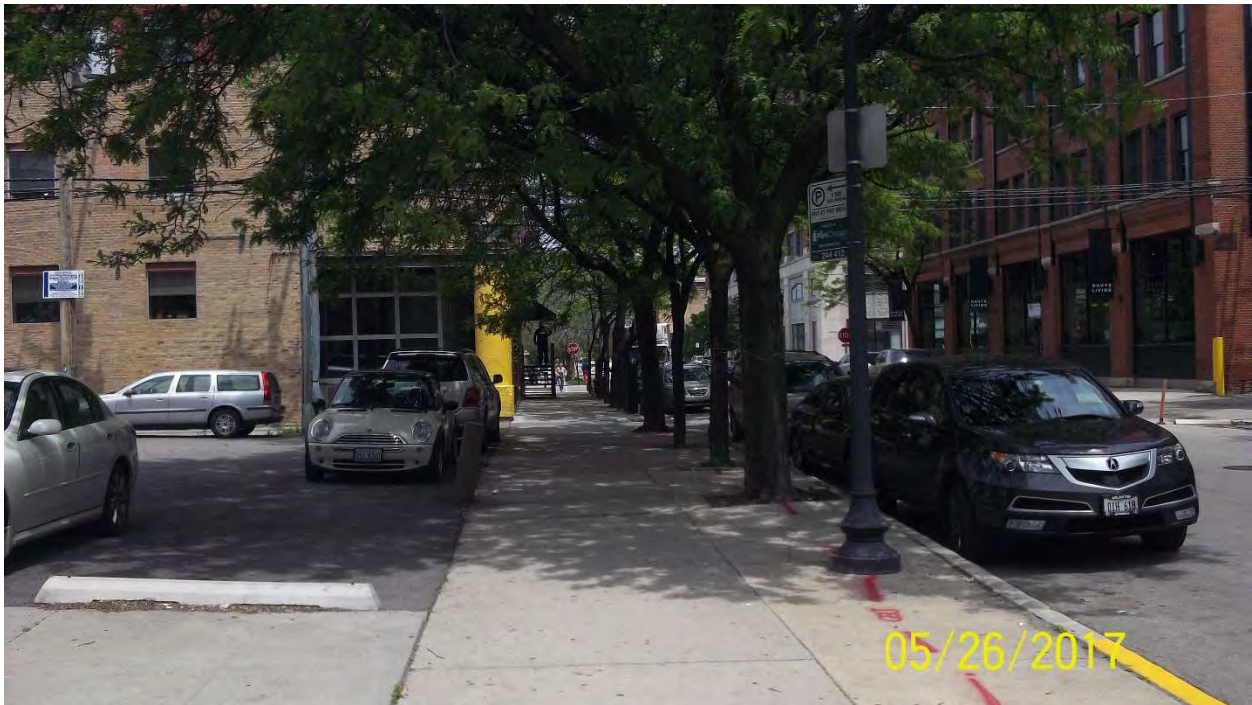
Northwest corner of Chicago Ave. / Franklin St. – Looking North
